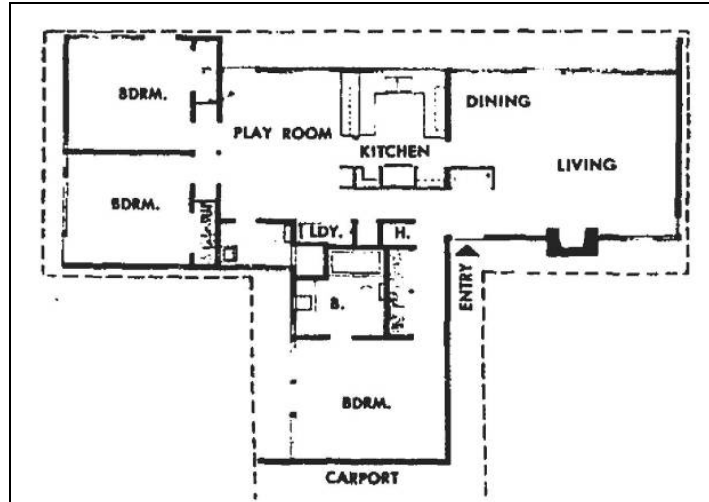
Floor plan for Blue Ribbon Tract home features separate wings for living area, children's rooms, and parents' room.
